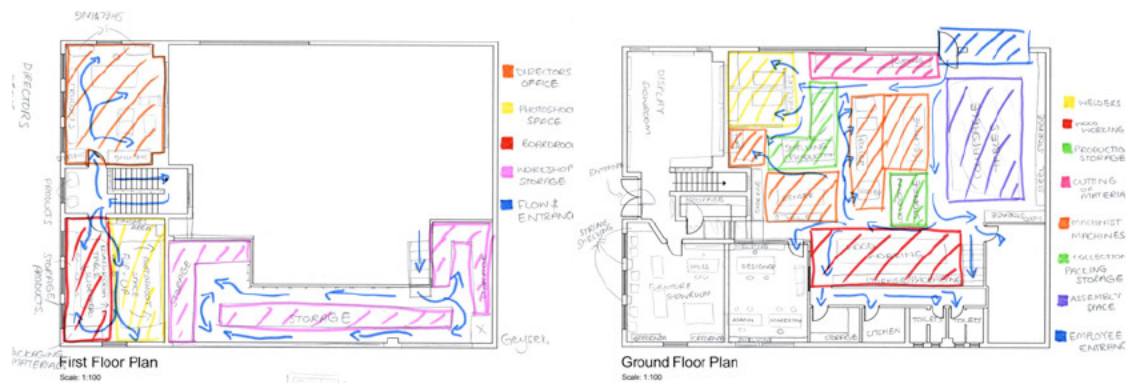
Bacon, S, 2020. *Floor Plan of Factory layout.
